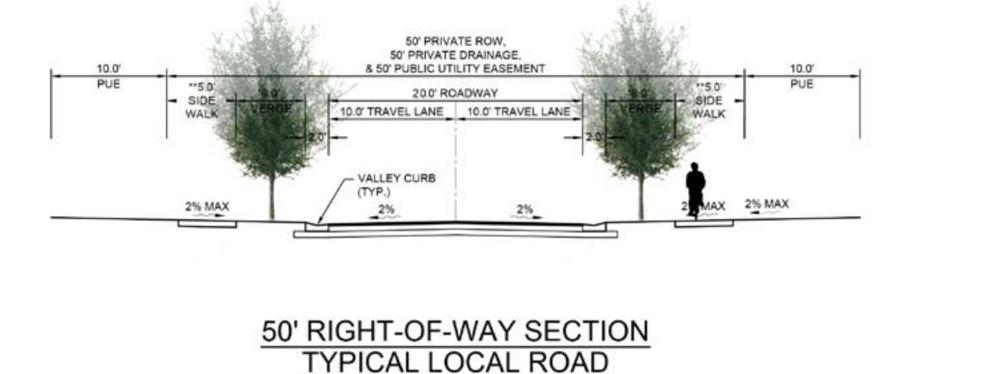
A1 Typical 50' ROW Local Street Type 2 Plan Street Tree - within verge
